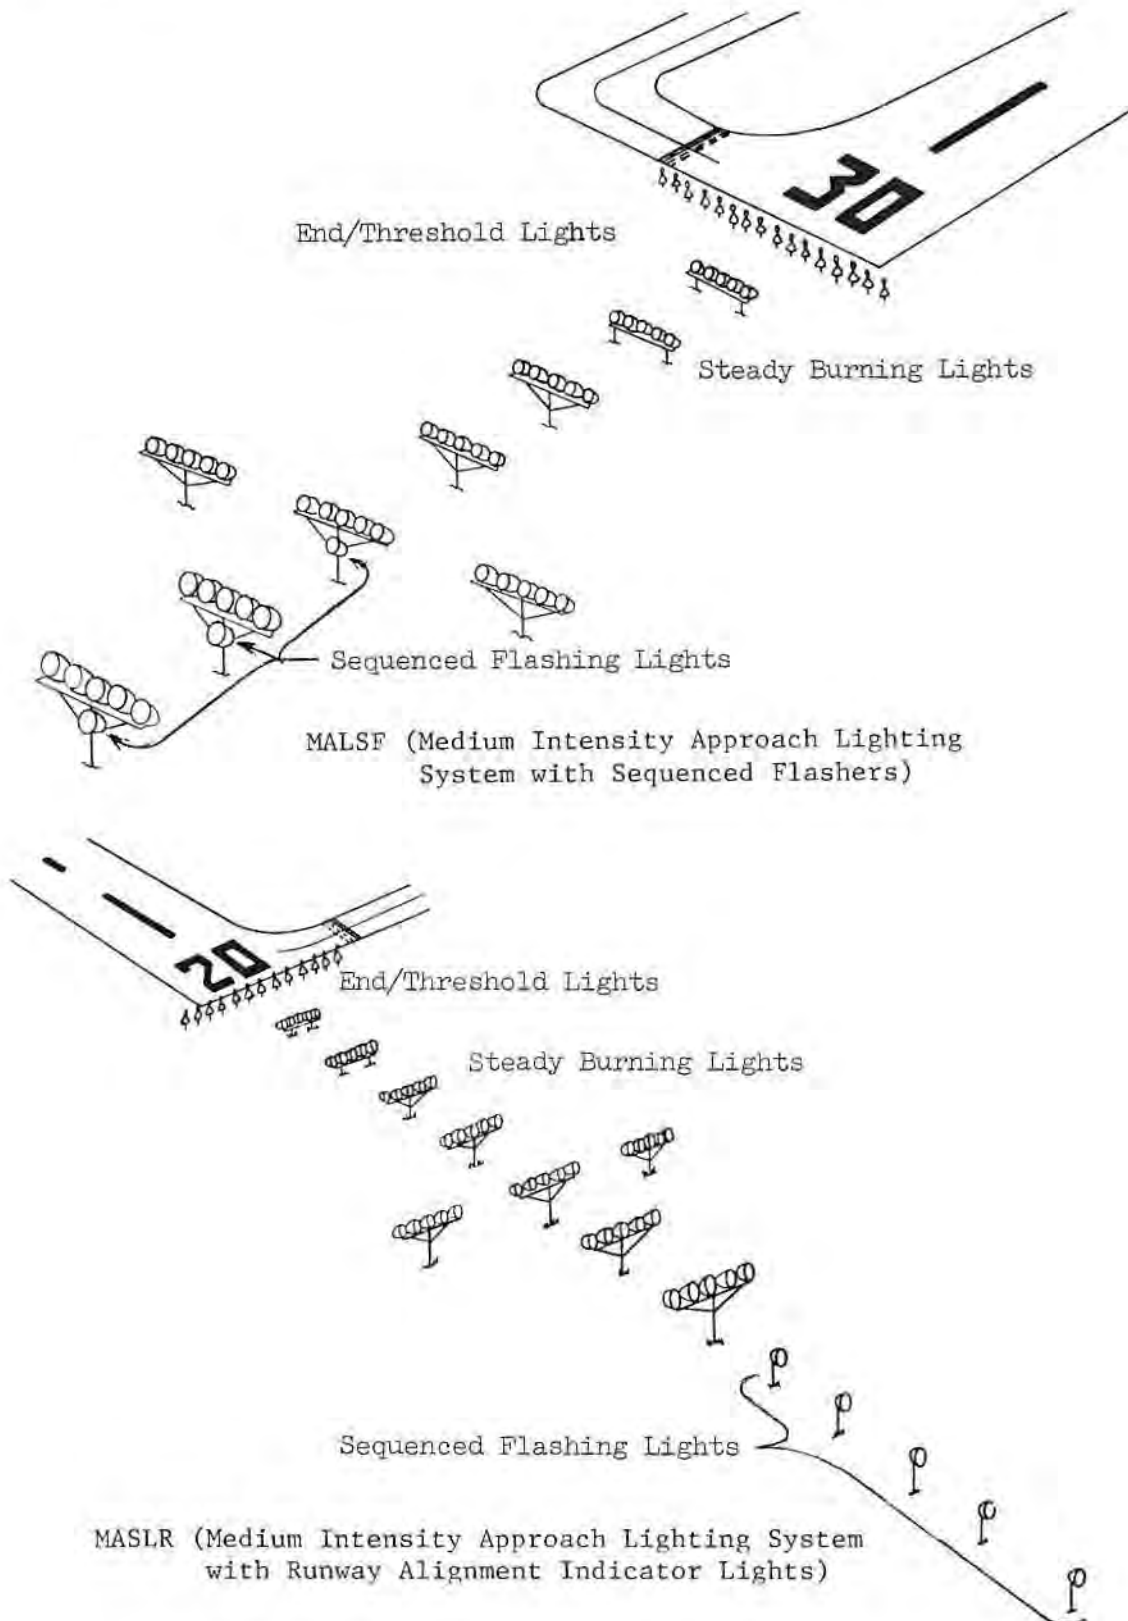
TYPICAL MALSF & MASLR INSTALLATIONS
